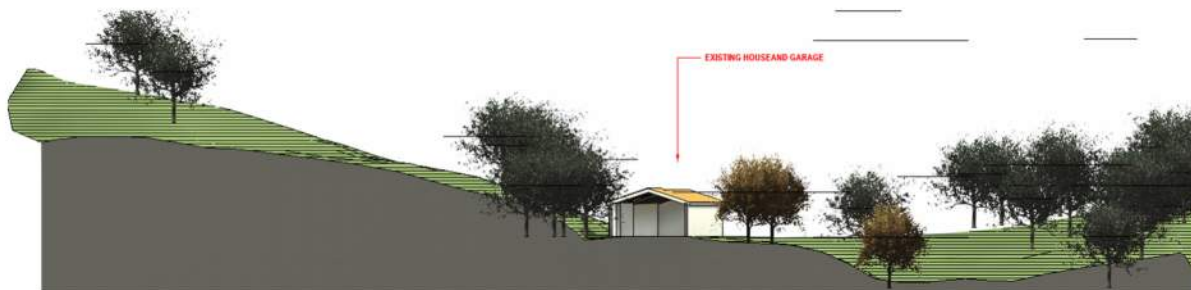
Profile of site showing location of existing house that sits up against a small hill that leads up to a more gradual pad
